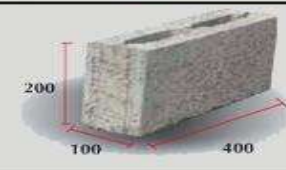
HOLLOW CONCRETE BLOCK
